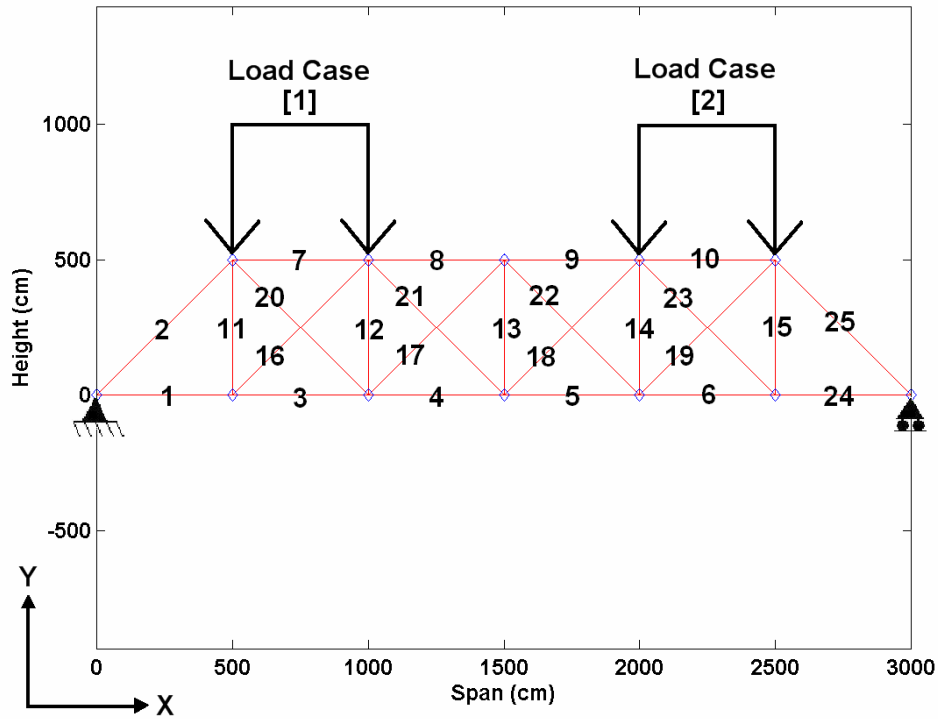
Simply-supported truss structure layout with truss elements labeled and loading conditions considered.
